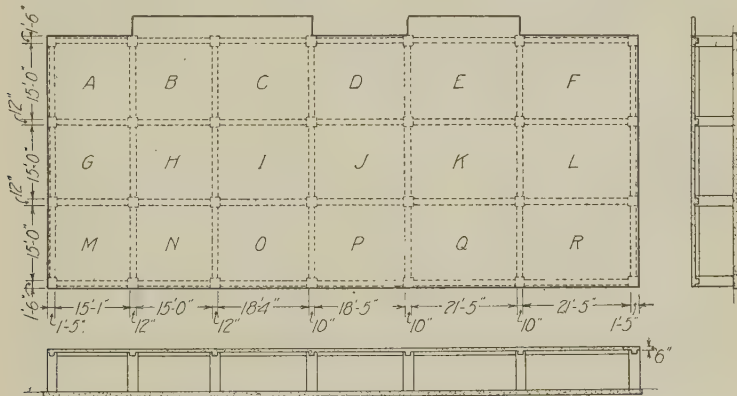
PLAN OF FLOOR SLAB TESTED AT WAYNESBURG, OHIO; THICKNESS, 6 IN.
